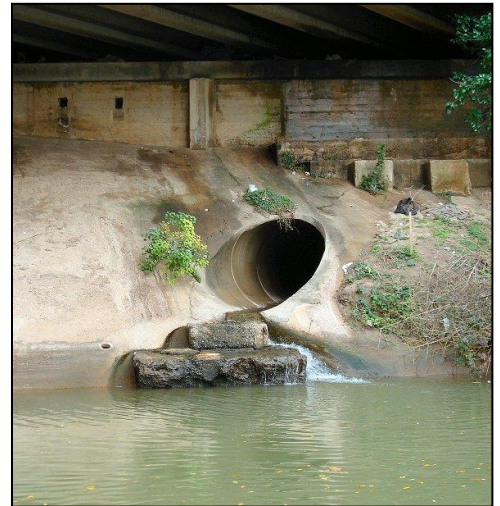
The Louisiana Street storm sewer outfall on the south bank of Buffalo Bayou near the west side the bridge (in a photo from 2008). (Photo: Louis F. Aulbach)
